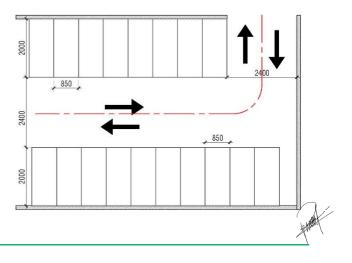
Minimum dimensions for 90° motorbike parking one-way
